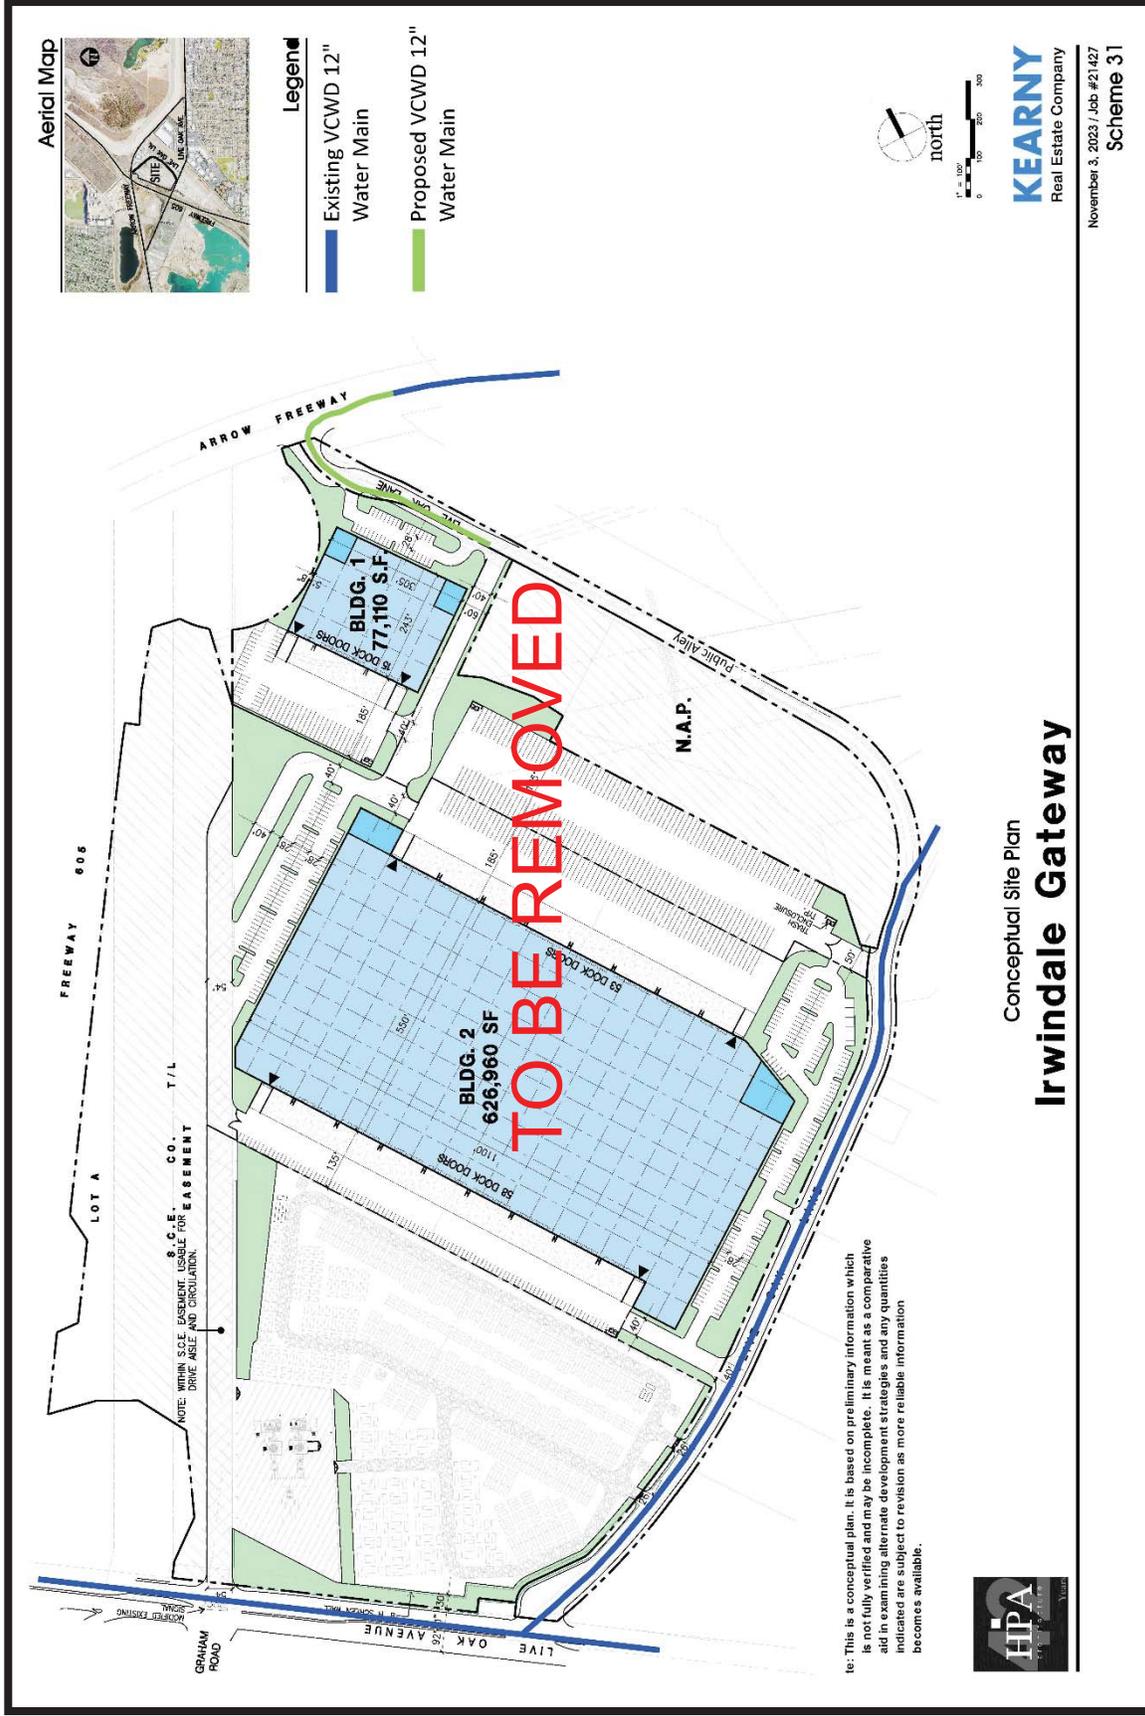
CONCEPTUAL WATER PLAN WITH BESS
